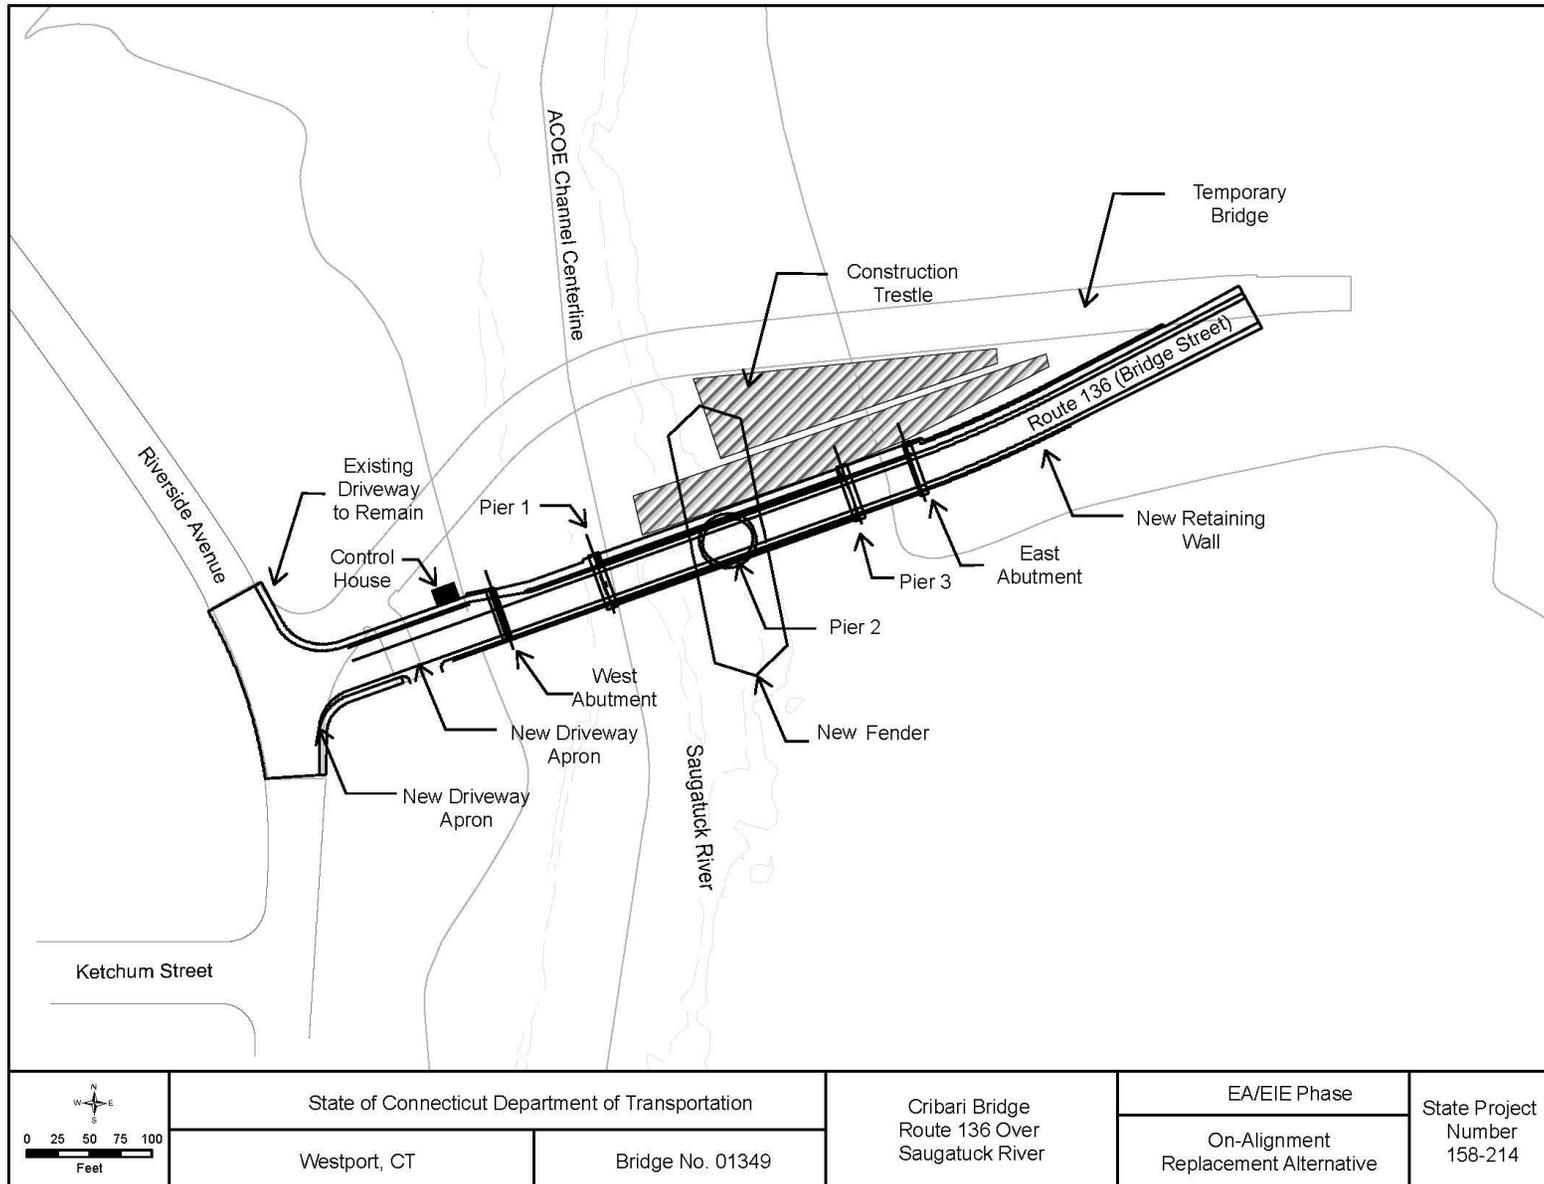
Conceptual Plan for the On-Alignment Bridge Replacement Alternative (the Preferred Alternative)
